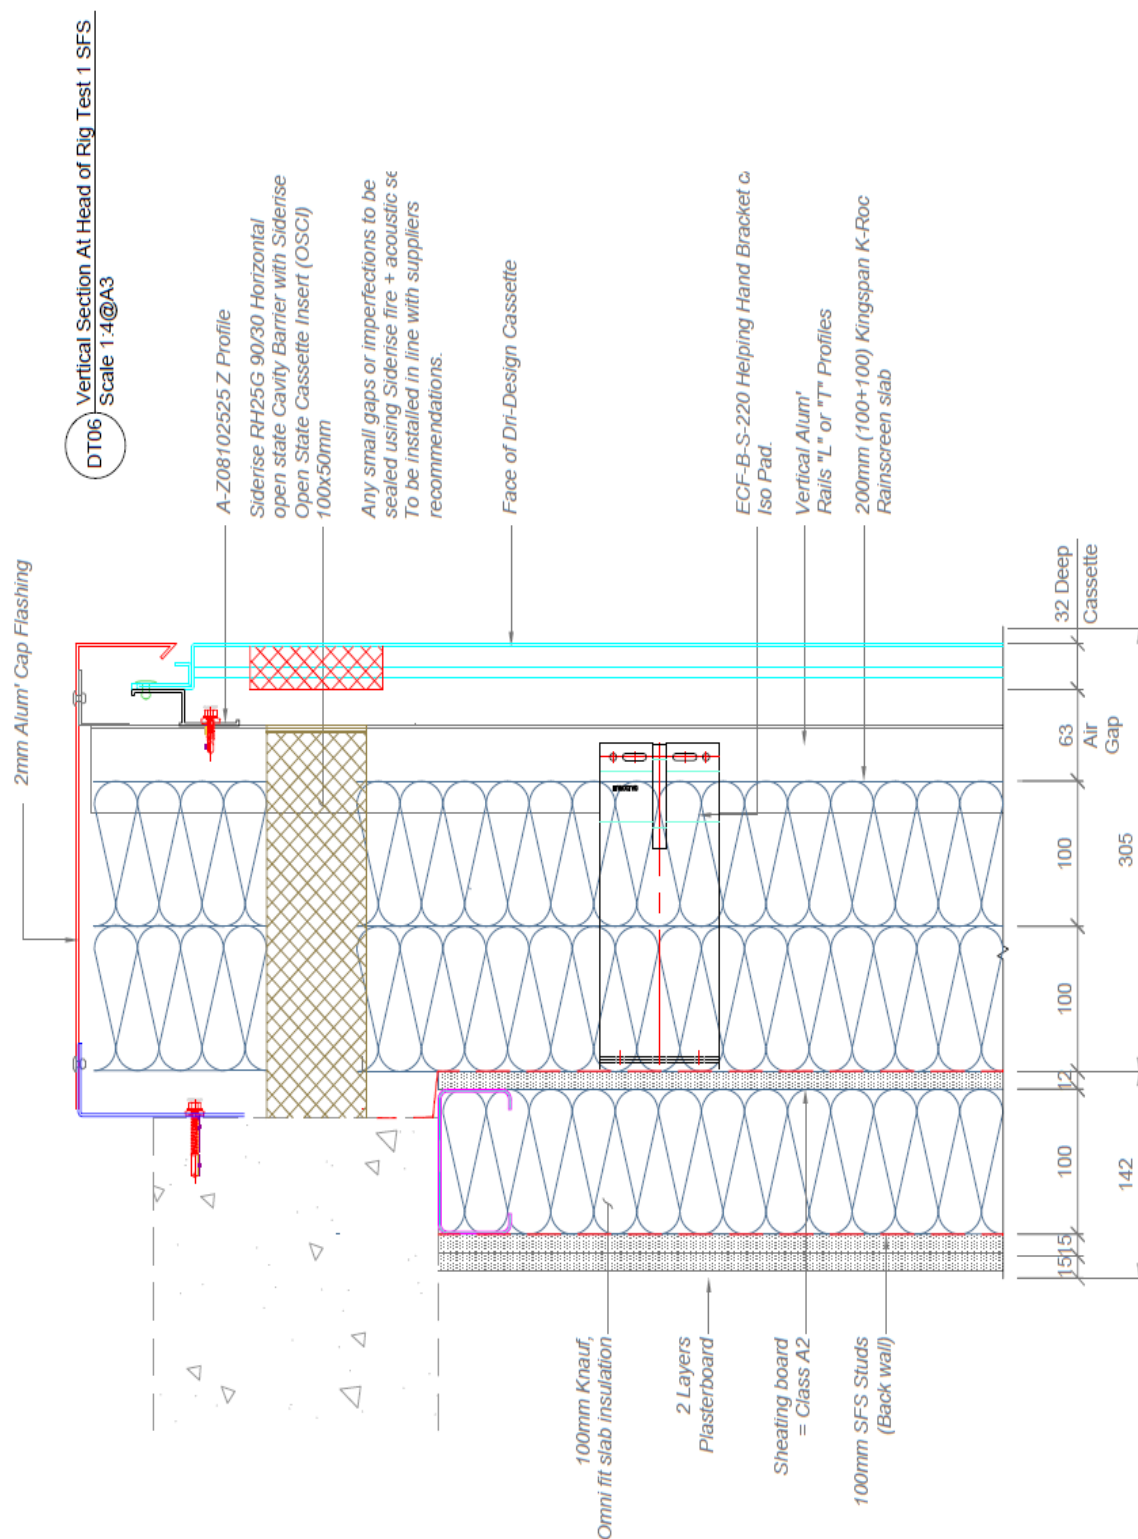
Sketch of façade system detail. Vertical section at head of rig.
